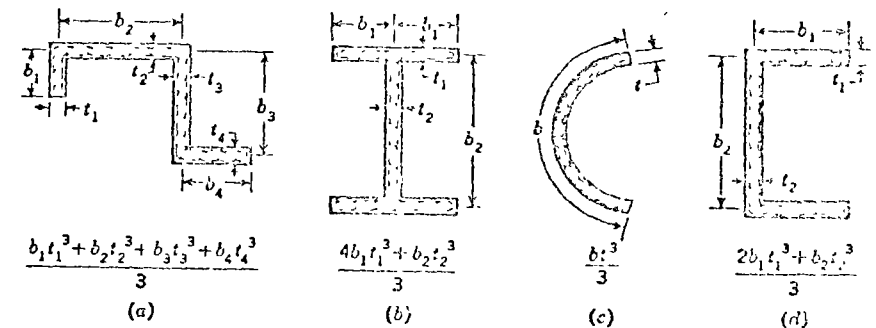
Typical thin-walled open sections and their corresponding torsional constant, J .
